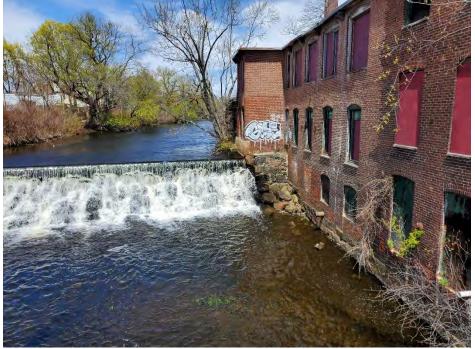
Spillway dam and eastern bank. Looking north (upstream) from the Winter Street bridge.
